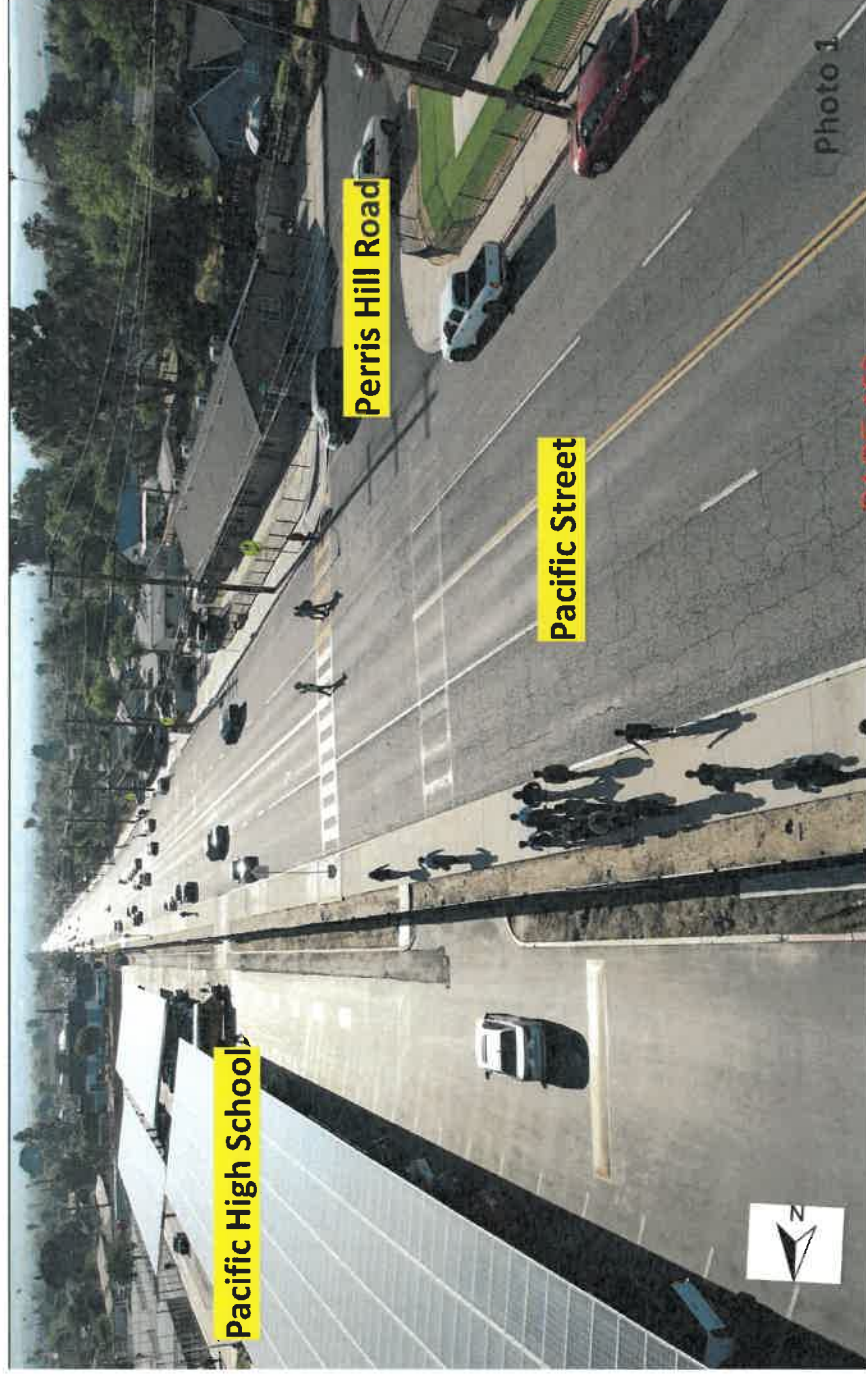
shows Pacific Street looking east near the intersection of Pacific Street and Perris Hill Road. Pacific High School is on the north side of the 4-lane road. Students must cross a busy street to access the campus from the south.
